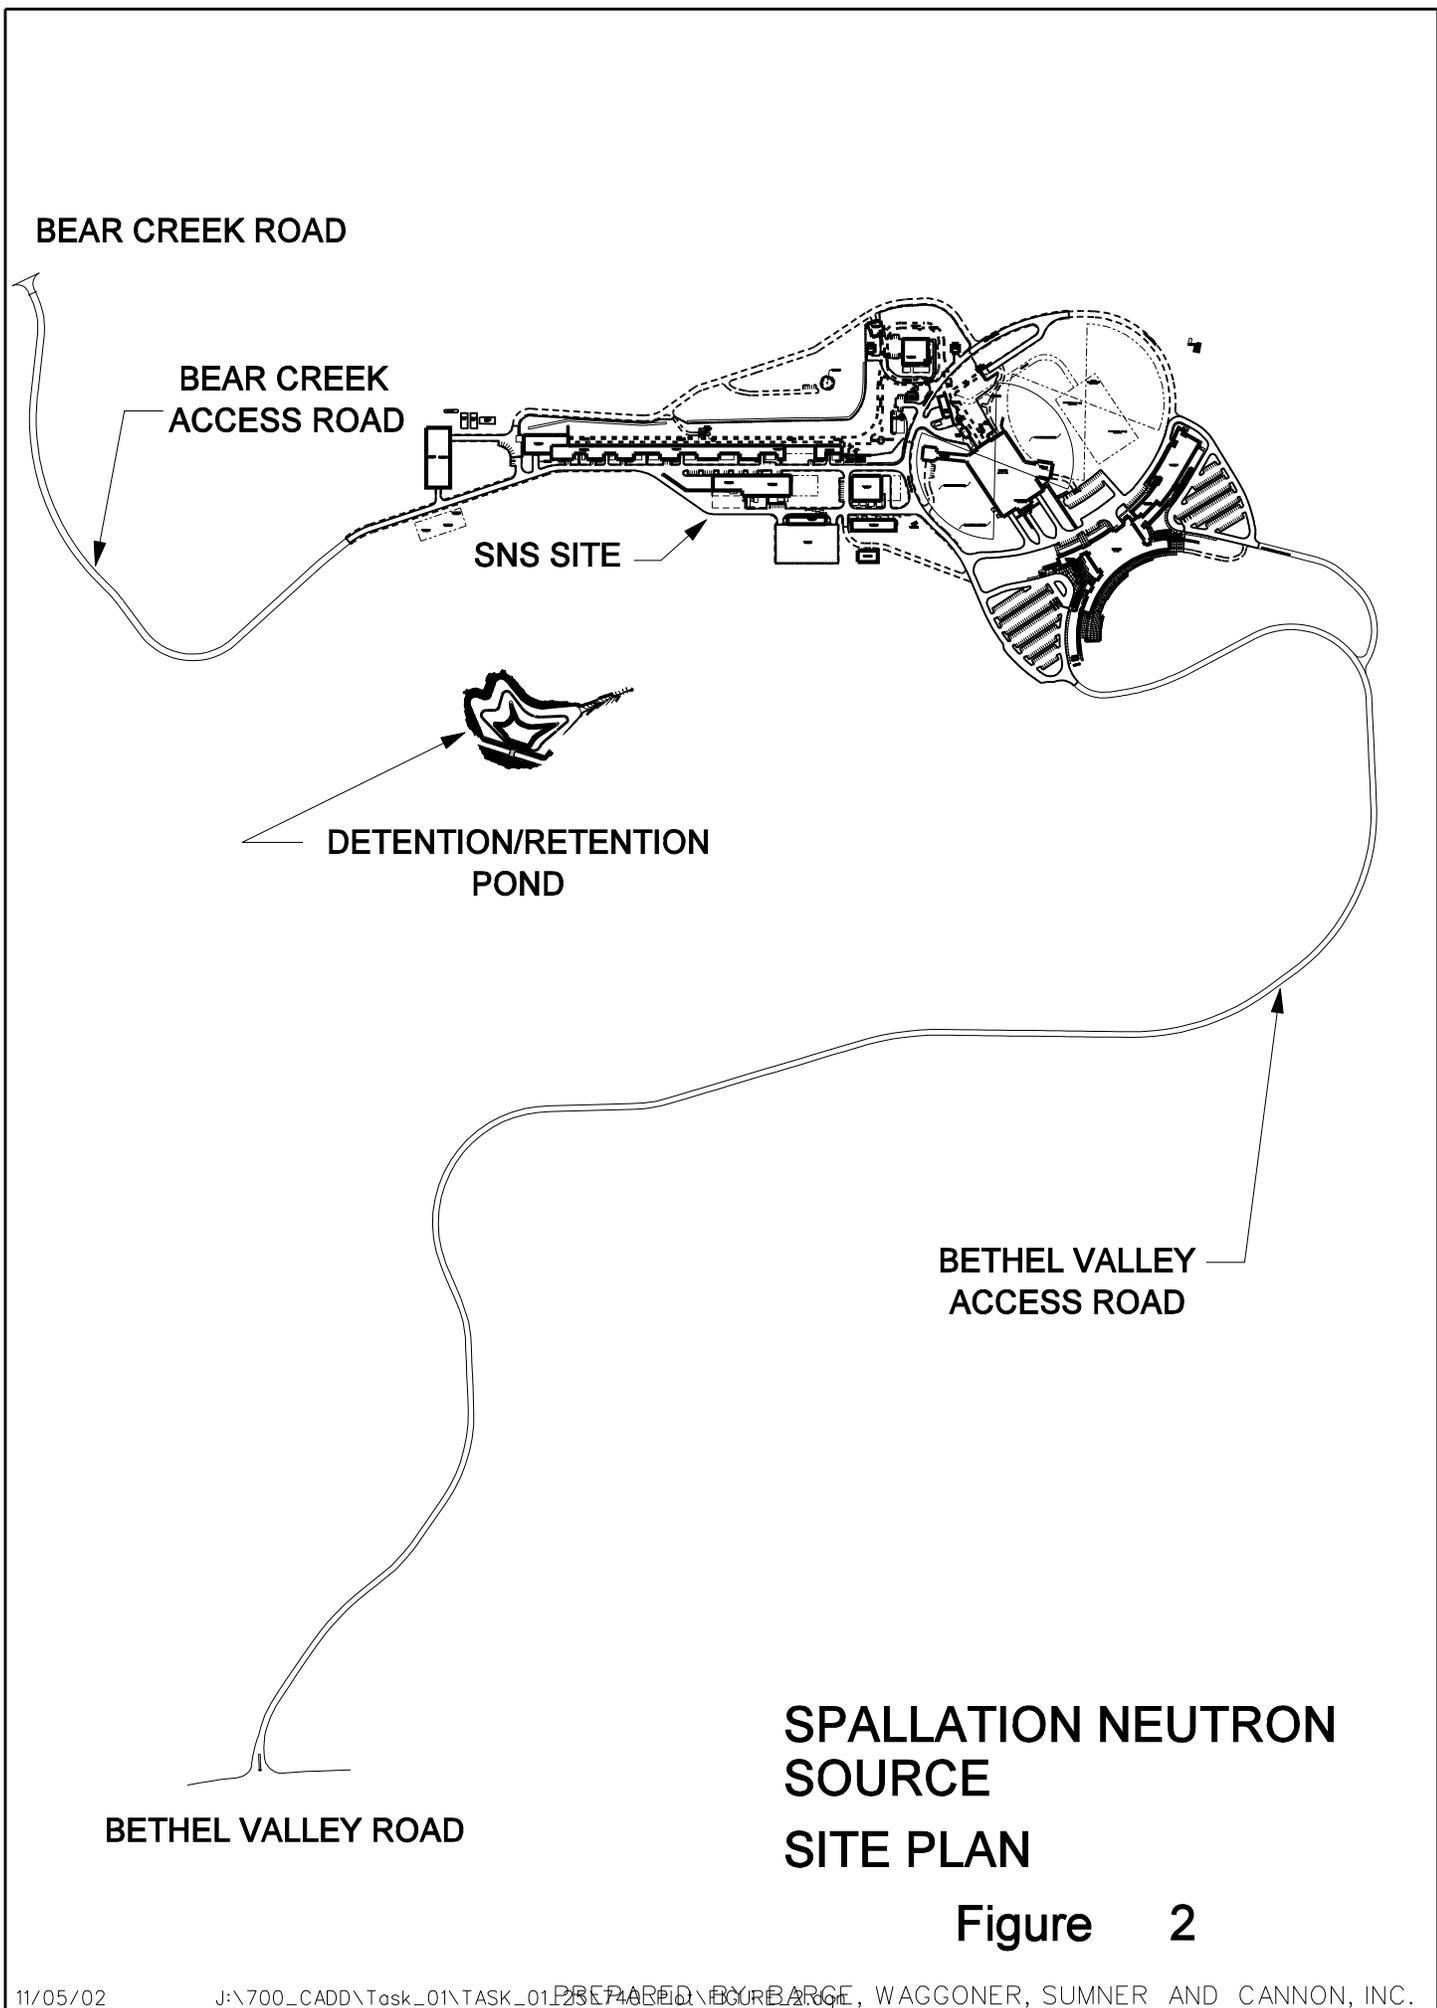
depicts the overall site plan, including the two access roads and the storm water detention ponds. Construction of the two access roads has been completed and
